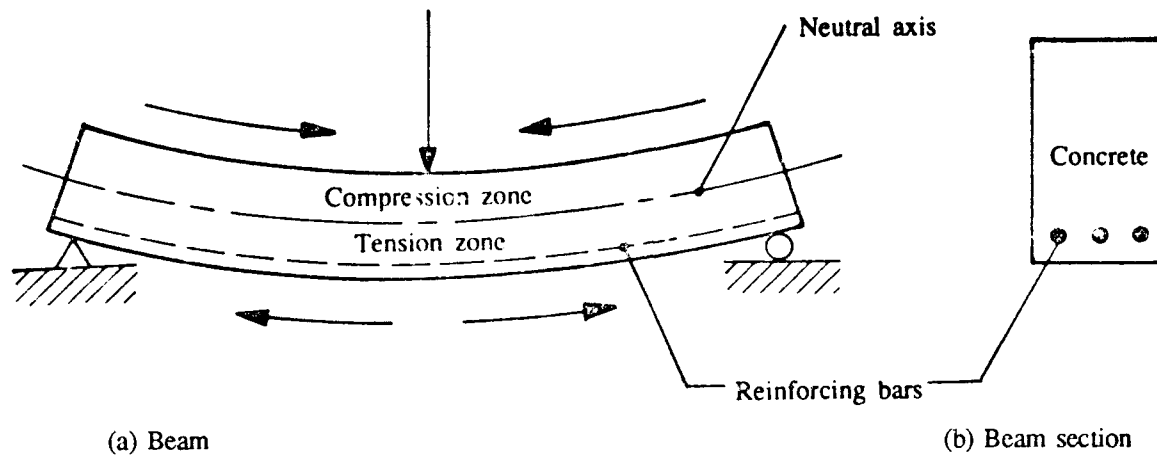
Compression and tension zones in a typical reinforced concrete beam.
